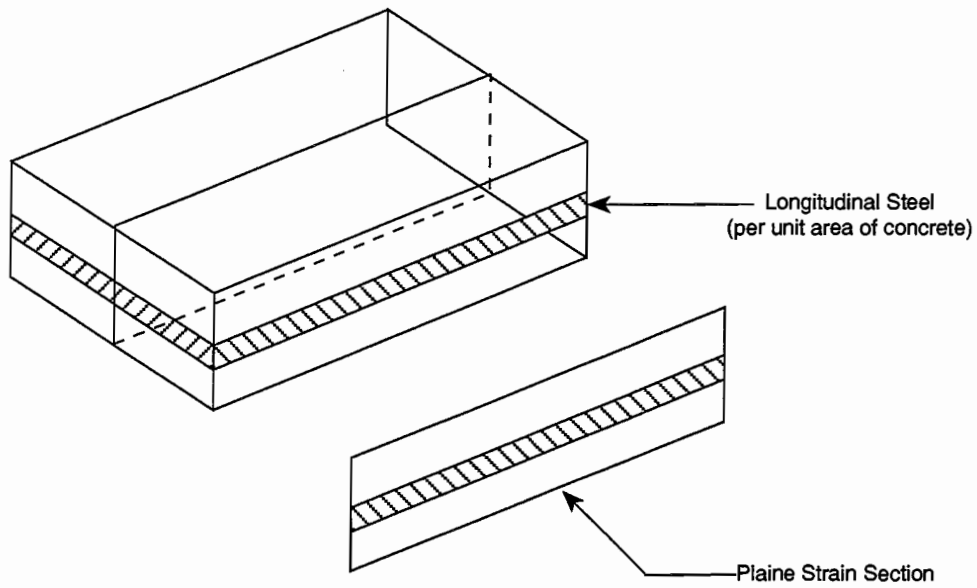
Three-layered view of pavement and cross-section considered for plan strain analysis
